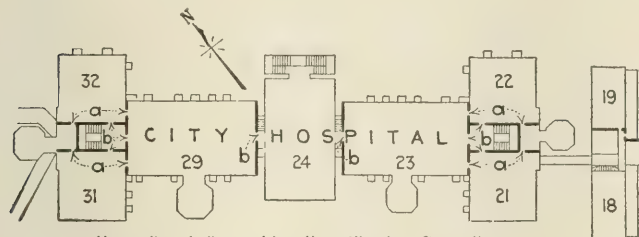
PLAN OF CITY HOSPITAL BUILDING, SHOWING OLD WALLS UTILIZED AS FIREWALLS
